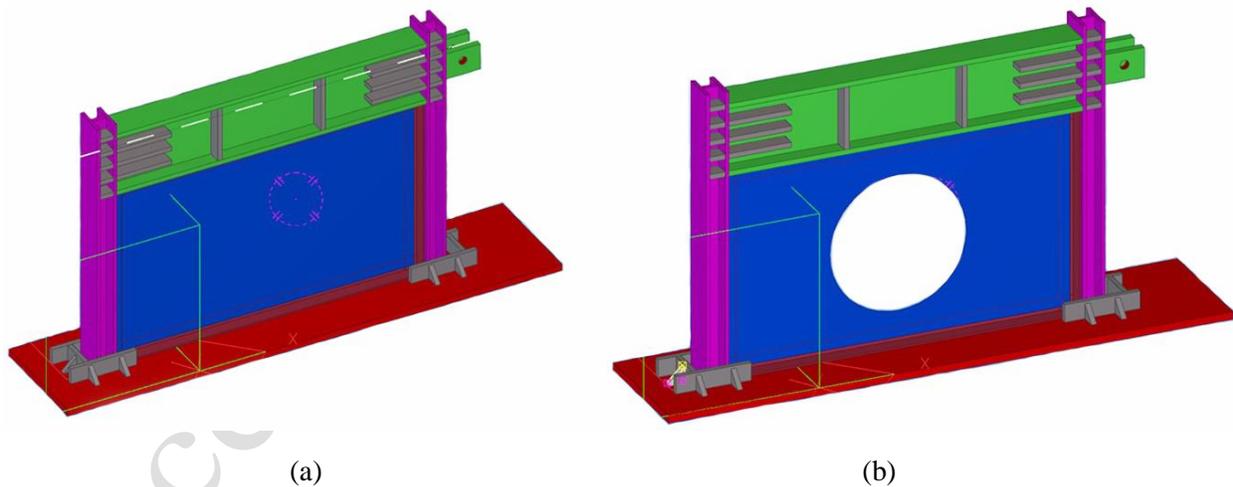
Final design of the steel plate shear wall (a) without opening and (b) with opening
